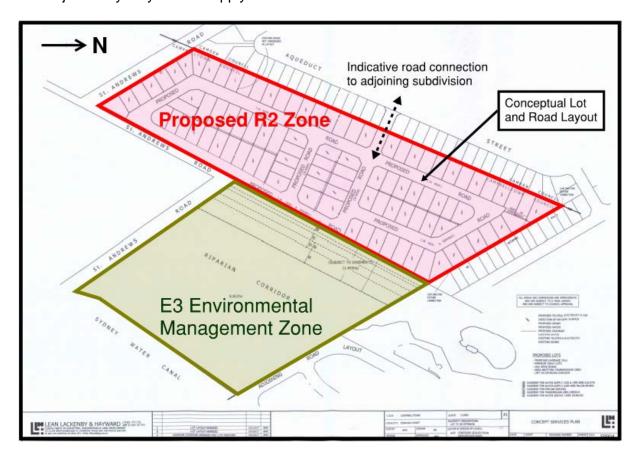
Proposed Zoning and Indicative Subdivision Layout
